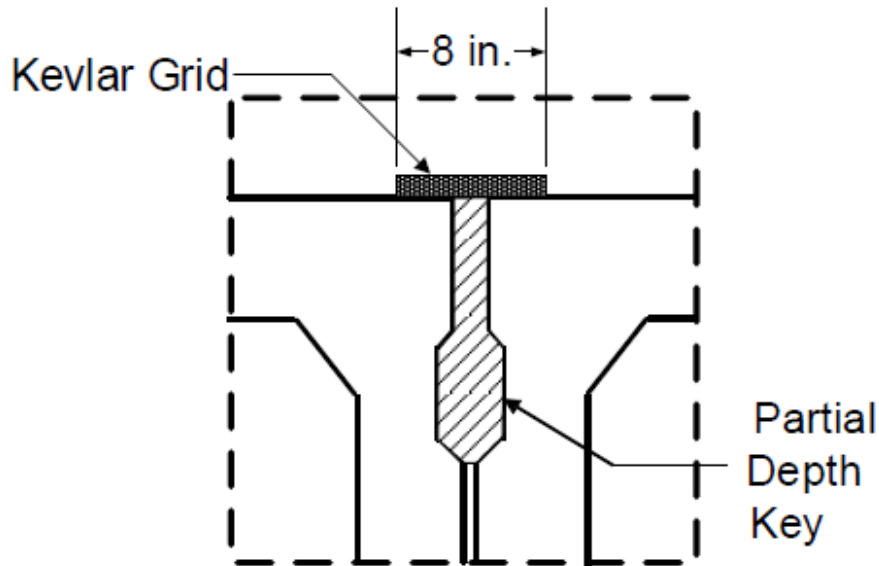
Typical Detail of Kevlar and Epoxy Connection (Halbe, 2014)
